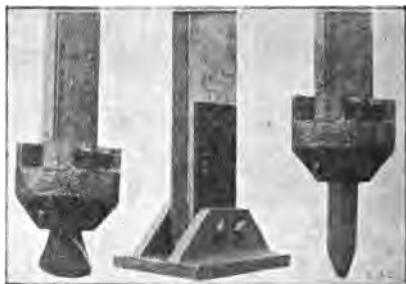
Chisel and Pick Heads and Tamper Head for Use with Power Picking and Tamping Machine.
